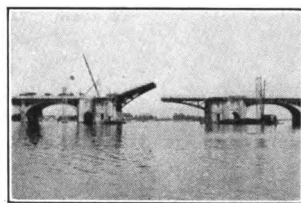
Arches and bascule. Bascule piers are widened to provide anchorage for adjacent arch. Hanover St. Bridge, Baltimore.
